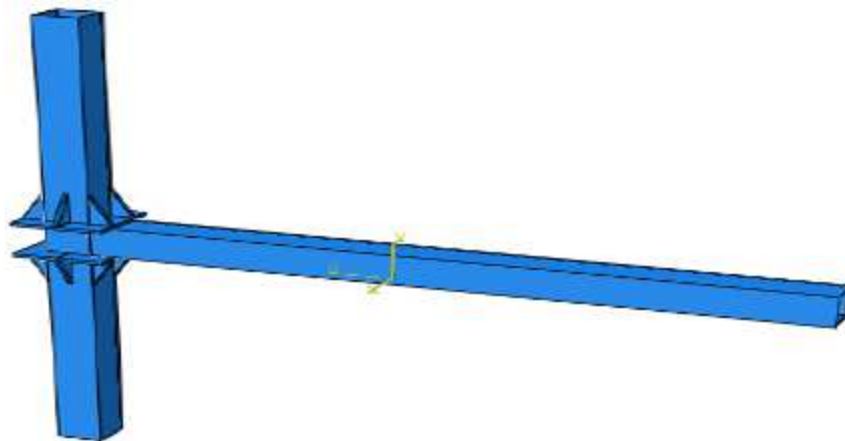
CONNECTION DETAIL USING CHANNEL SECTIONS
